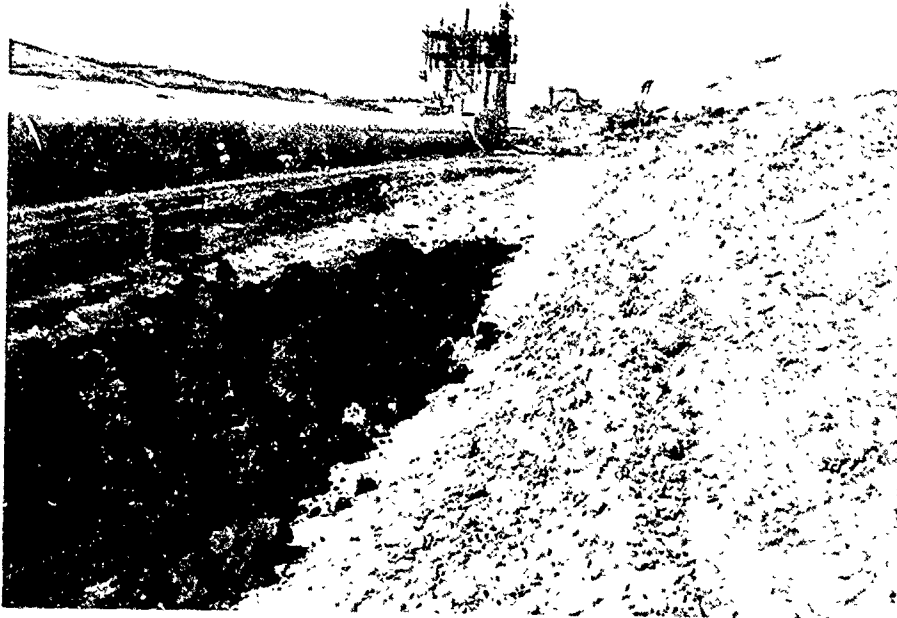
Outlet works conduit, left side, looking upstream. Placing fill on fresh shale surface.
